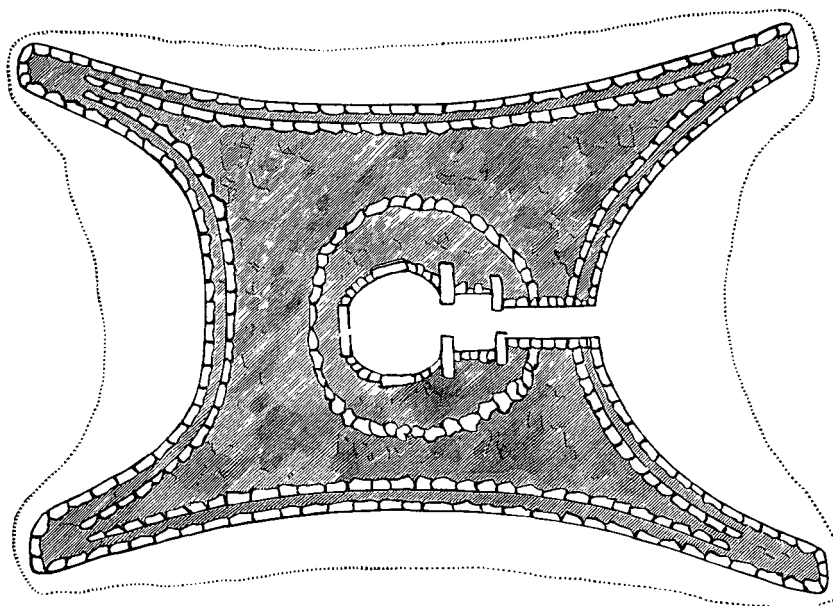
Ground Plan of Horned Cairn at Garrywhin, Caithness (80 feet in length).
